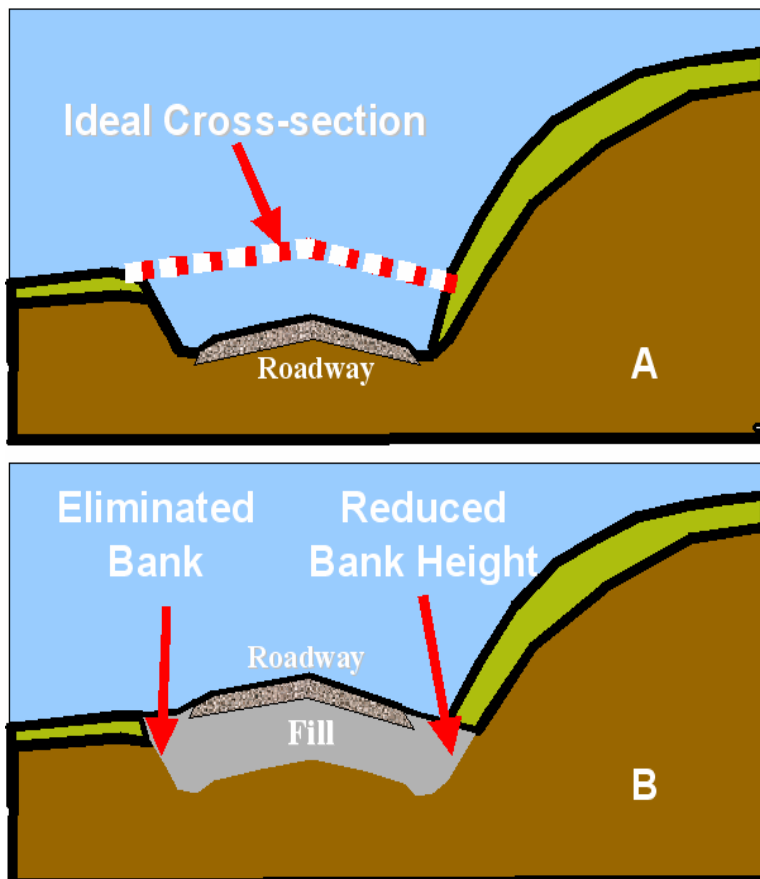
A shows a typical existing entrenched roadway. Figure 5-26B shows the filled roadway, completely eliminating a bank on one side and reducing the height of the bank on the other side. Depending on terrain, etc, drainage could be sheet-flowed off the road without a ditch on the one side. The road no longer serves as the drainage channel and will experience far less surface [erosion](#), rutting or other degradation. Snow removal no longer becomes a problem since we now have a place to plow it.
